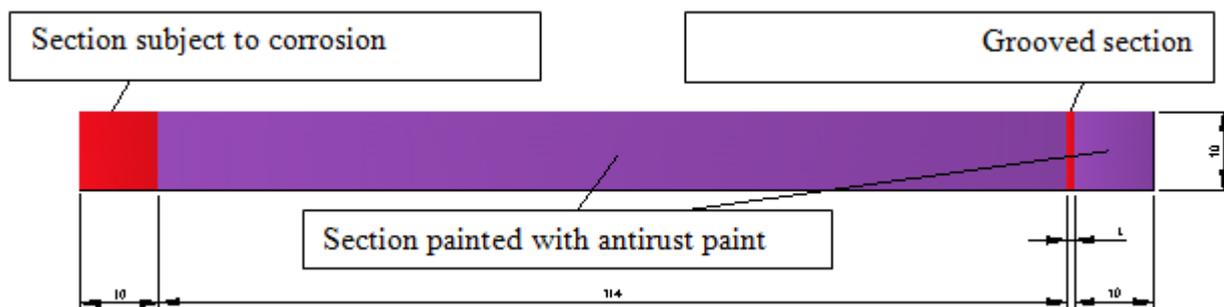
Schematic details of steel reinforcing bar within the concrete mixes
